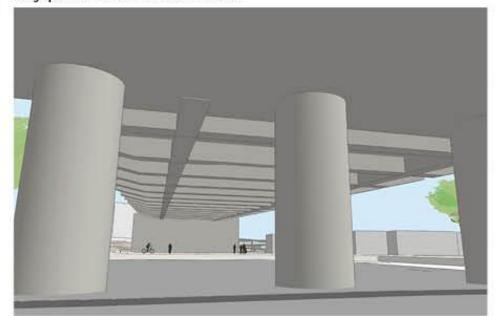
Visual Impacts – View from Naito Parkway under Burnside Bridge looking east – Cont.
